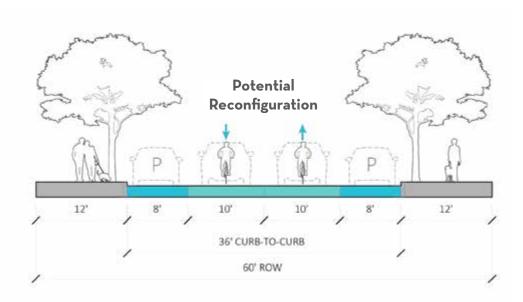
Potential Reconfiguration: One-Way, Shared Class III Bikeway/travel lane on a Neighborhood Collector/Local Street.
